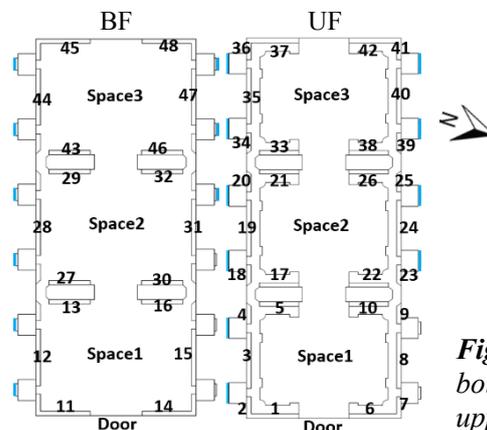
Top view of bottom floor (left) and upper floor (right)
